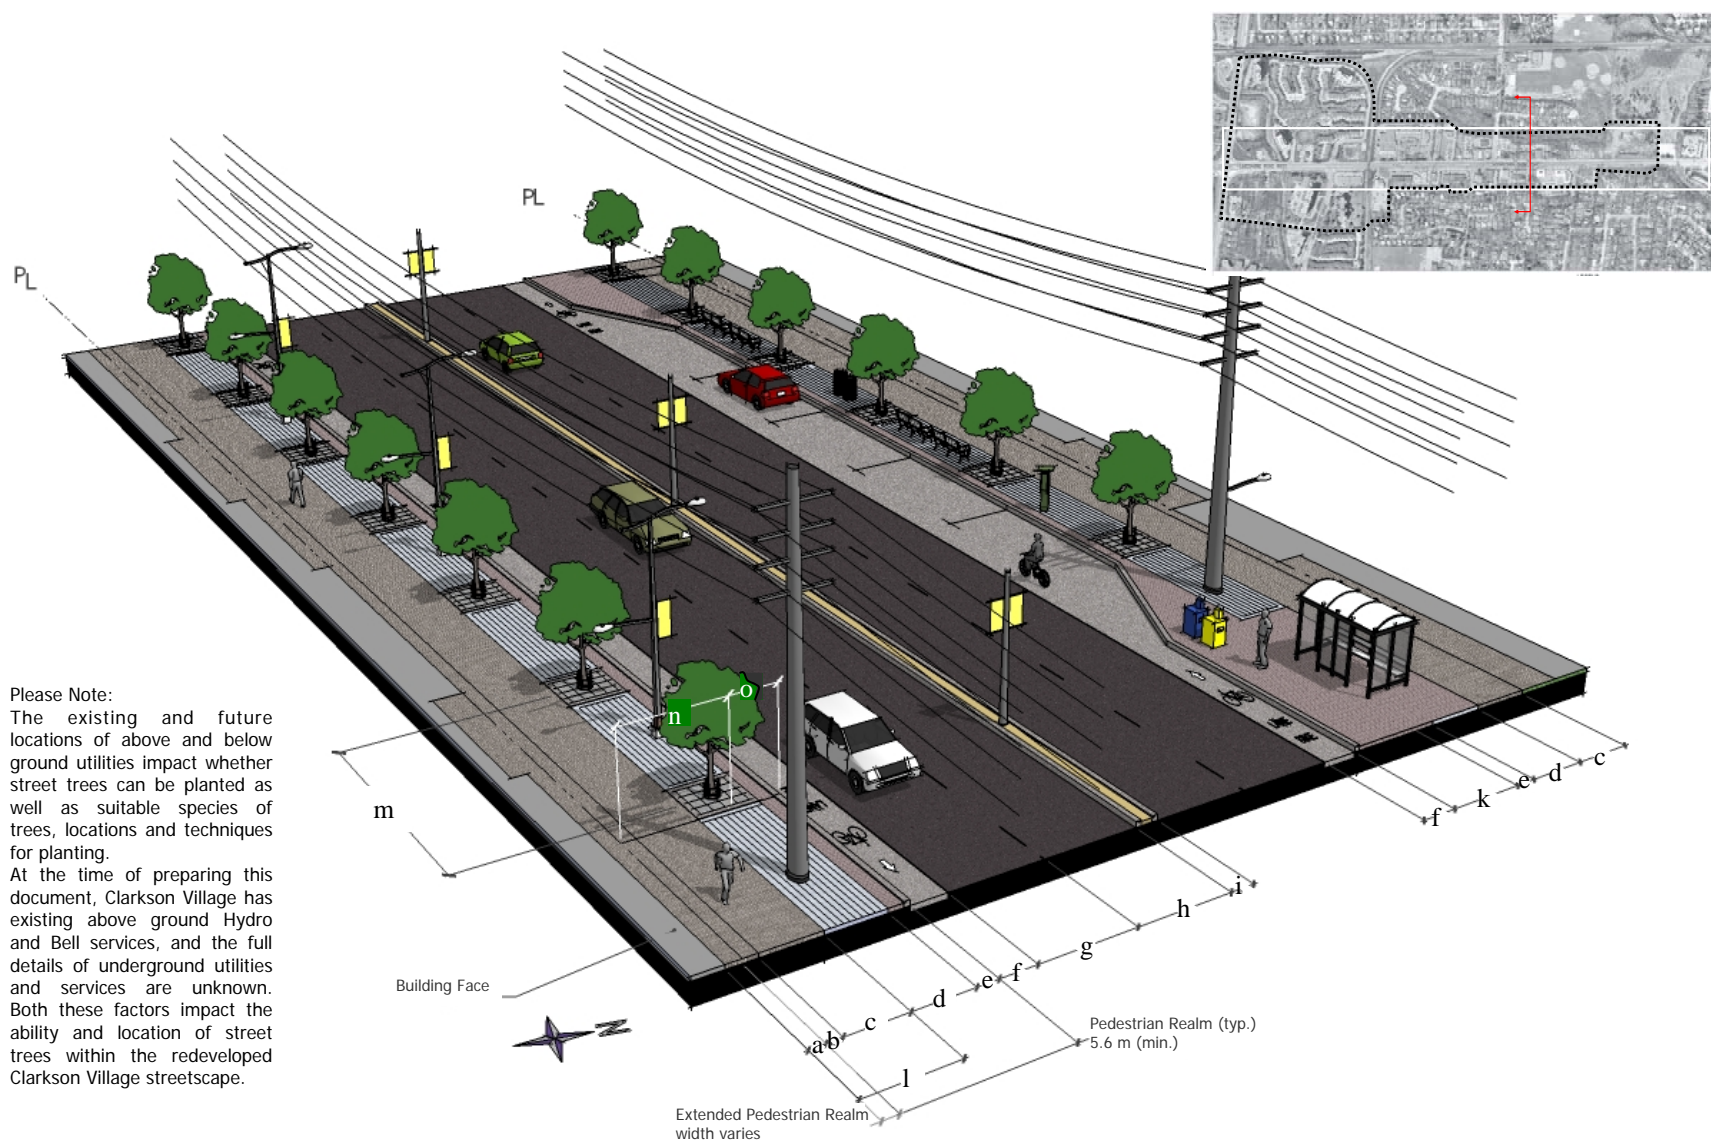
Village Core Area, Mid Block Cross Section, Proposed Streetscape
